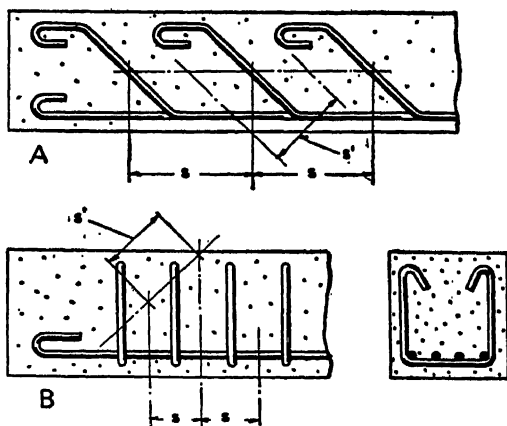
Reinforcement for Shear and Diagonal Tension.
